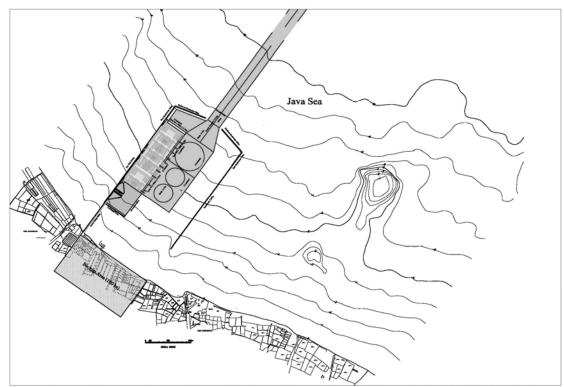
Facility Layout Plan of a New Cilamaya Terminal in Phases II (2020)
